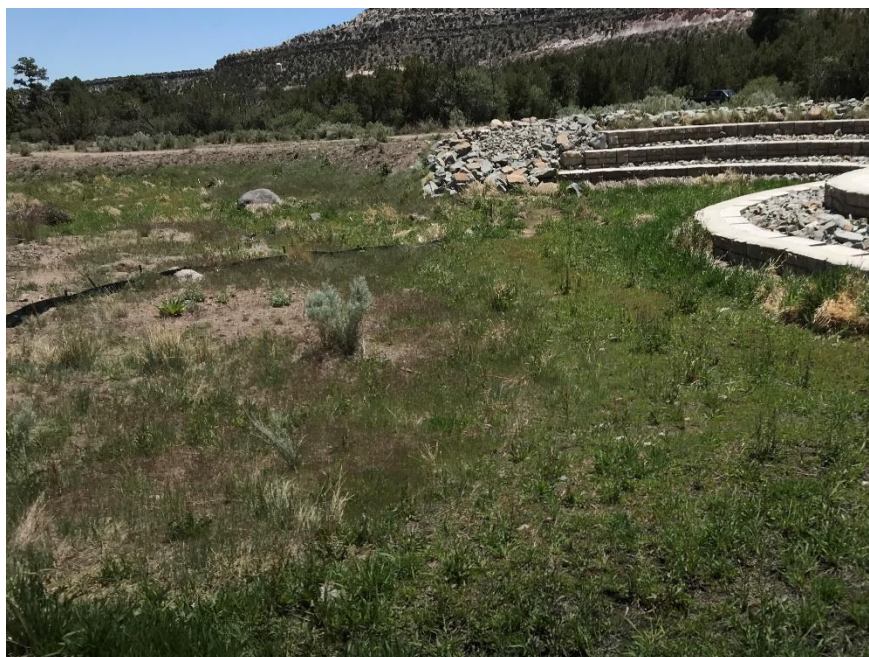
May 2021—Downstream south bank abutment, looking south
